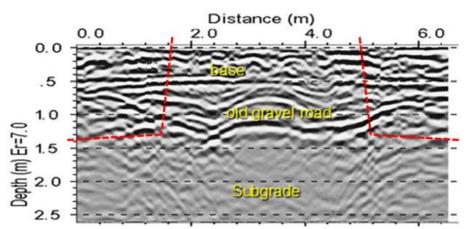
An example cross section from the ROADEX Ohtanajärvi test section in Sweden. The road has been upgraded from an old gravel road. The red lines indicate how the excavation should have been made before widening.
